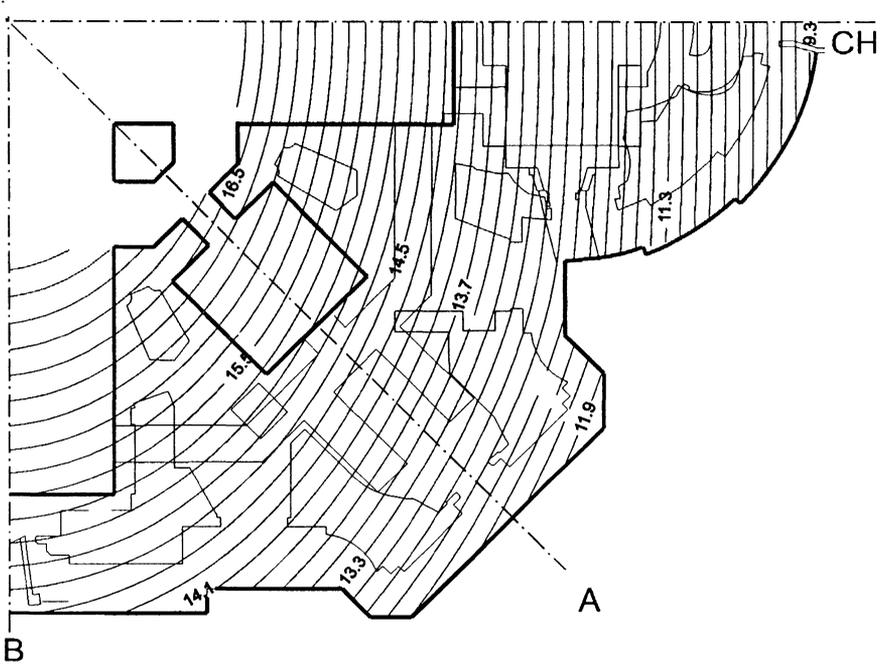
Settlements [mm] at foundation level $-7,15 \text{ m}$, load case: 'dead load without foundation and prestressing of main tension ring'
